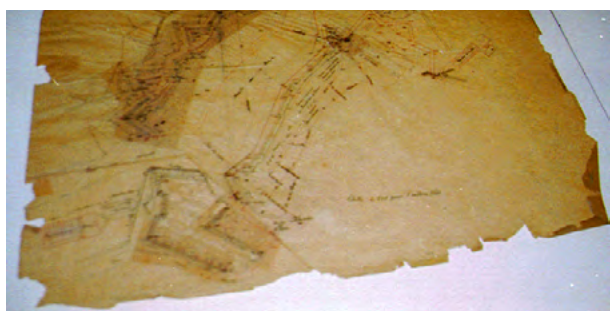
Plans-reliefs Museum, Paris: Fort de Joux Work plan
